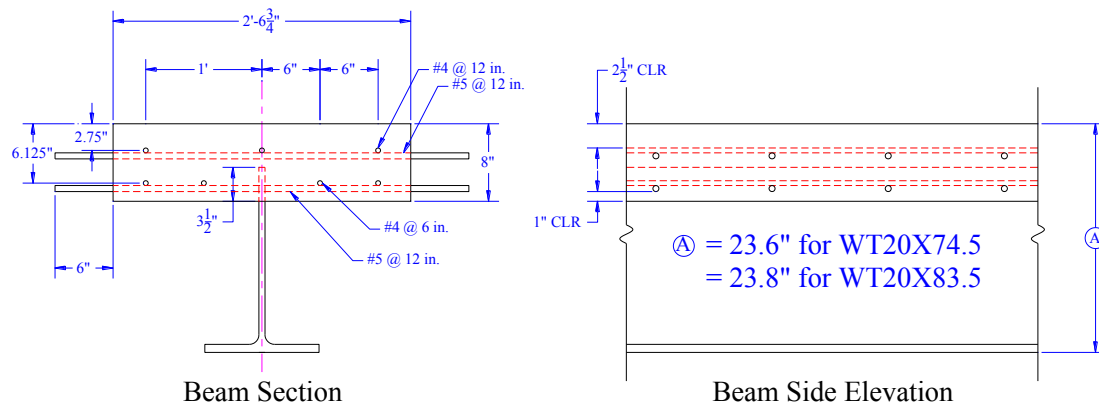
Beam section and side elevations (Aghi, Naito & Sause, 2014)
